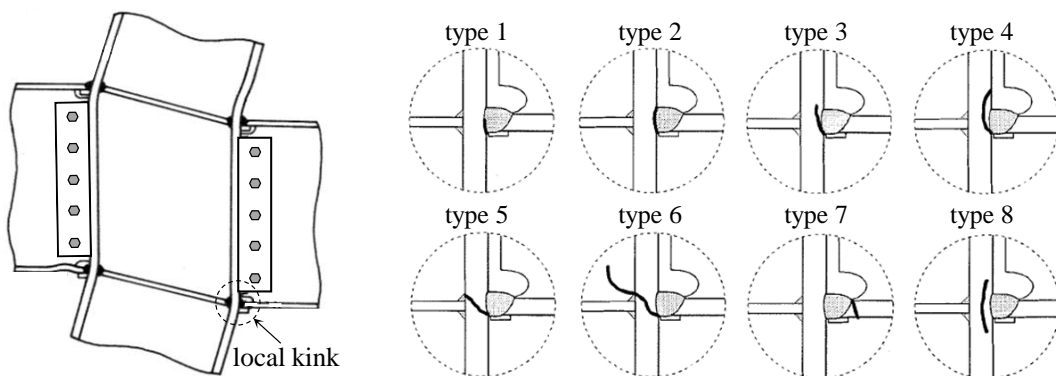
Schematic illustration of the beam-to-column connection fractures in Northridge 1994 earthquake [image adapted from Krawinkler et al. (1971); Tremblay et al. (1995)].
